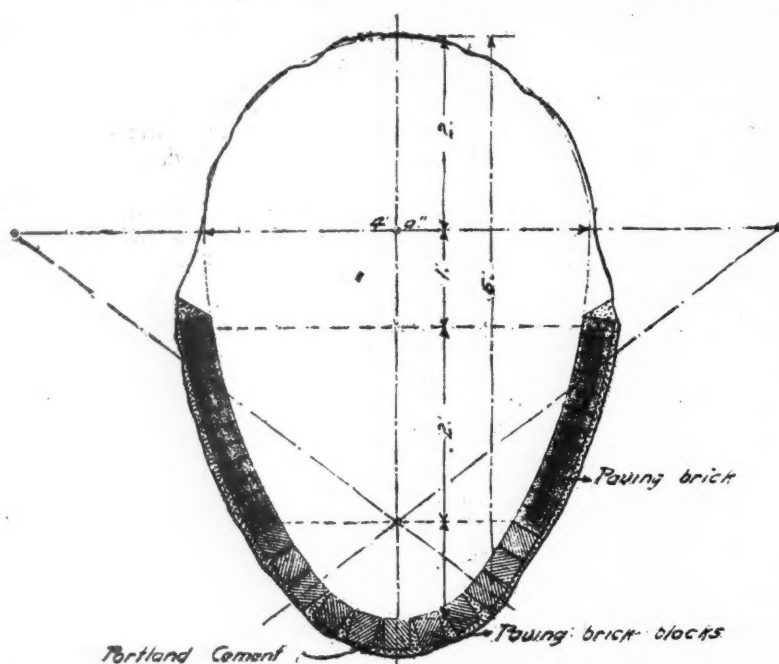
SECTION OF 6-FOOT BY 4-FOOT SAND ROCK SEWER TUNNELS.
